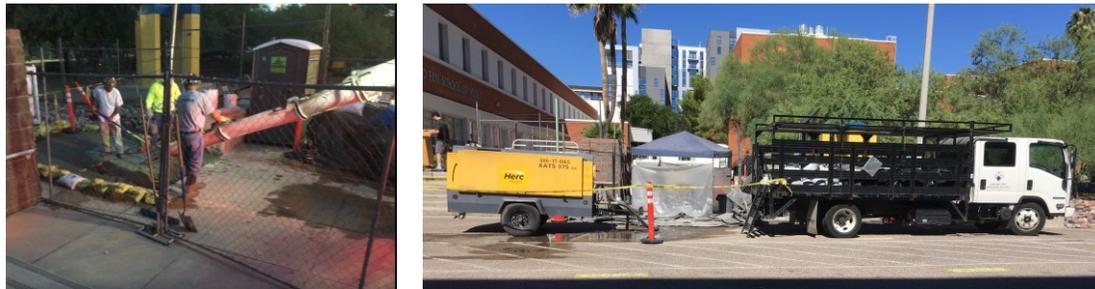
Placement of concrete to restore the collapsed sidewalk area
